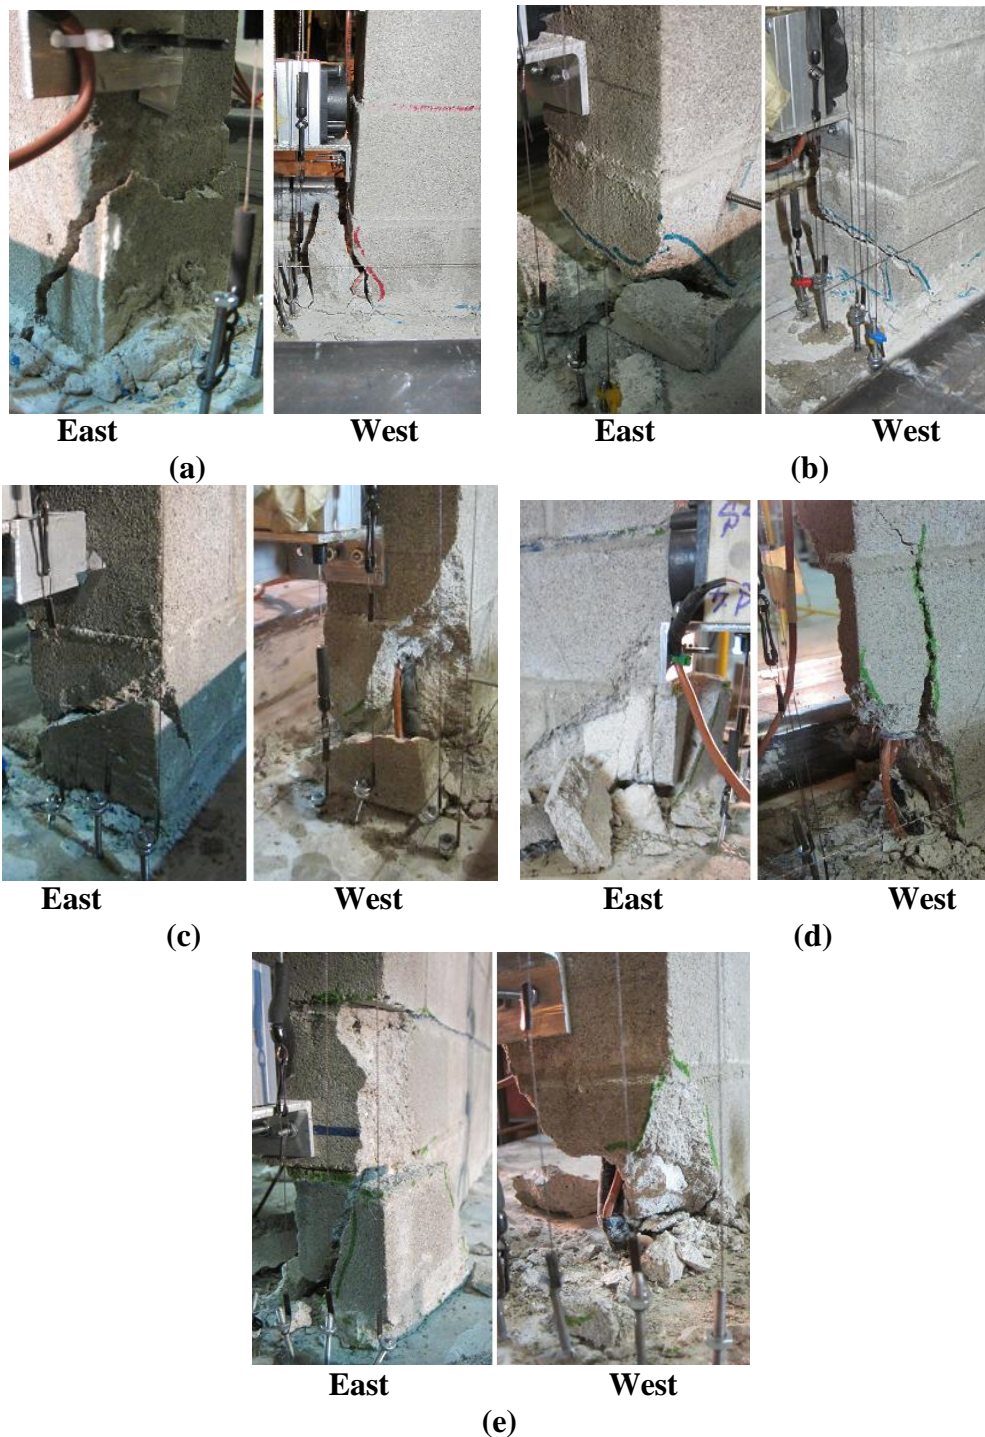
Damaged zones and bar buckling of the walls after the L3 level test: a) Wall 1, b) Wall 2, c) Wall 4, d) Wall 5 and e) Wall 6
